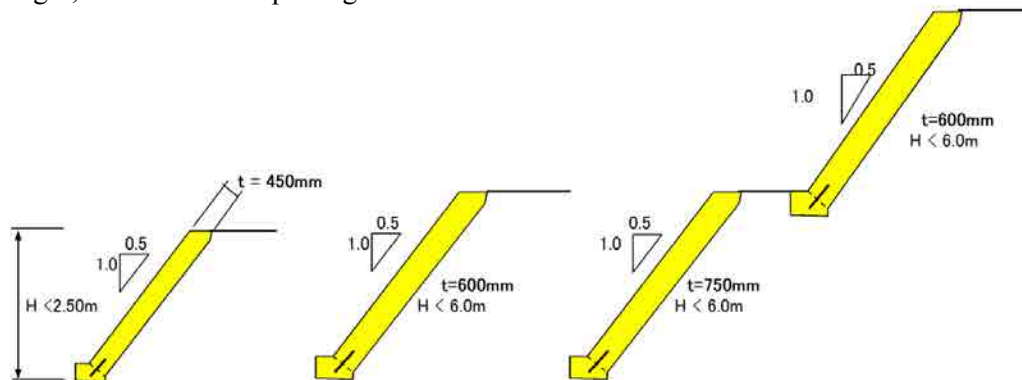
USE CONDITION OF STONE/RUBBLE-CONCRETE MASONRY
